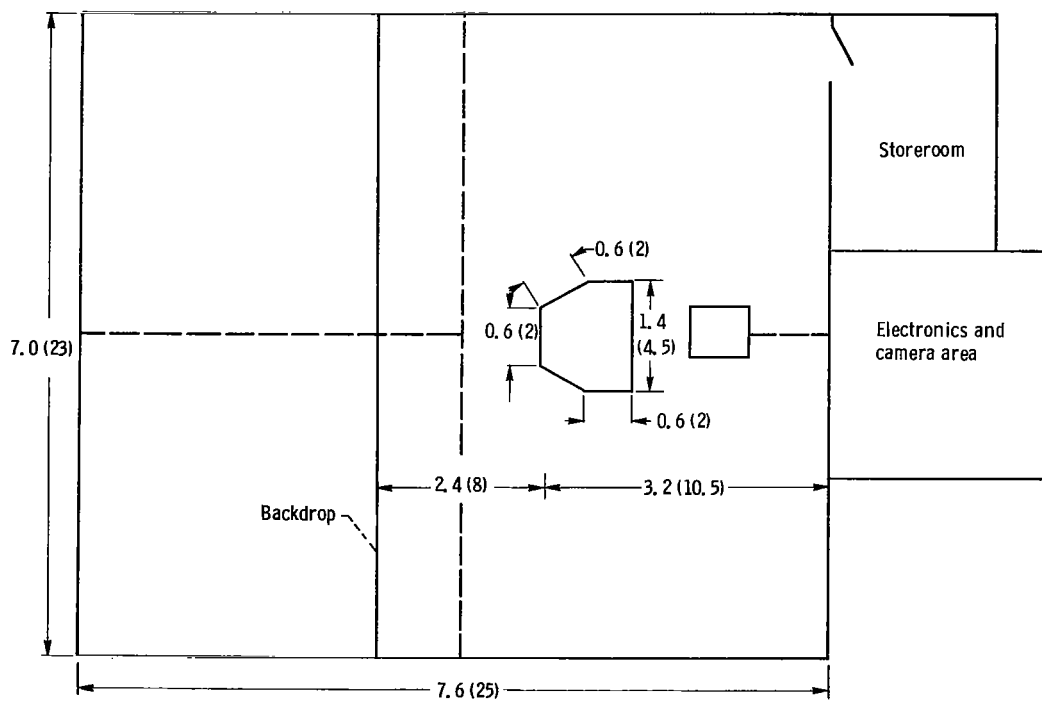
Teleconference room floor plan. (Dimensions are in m (ft).)
